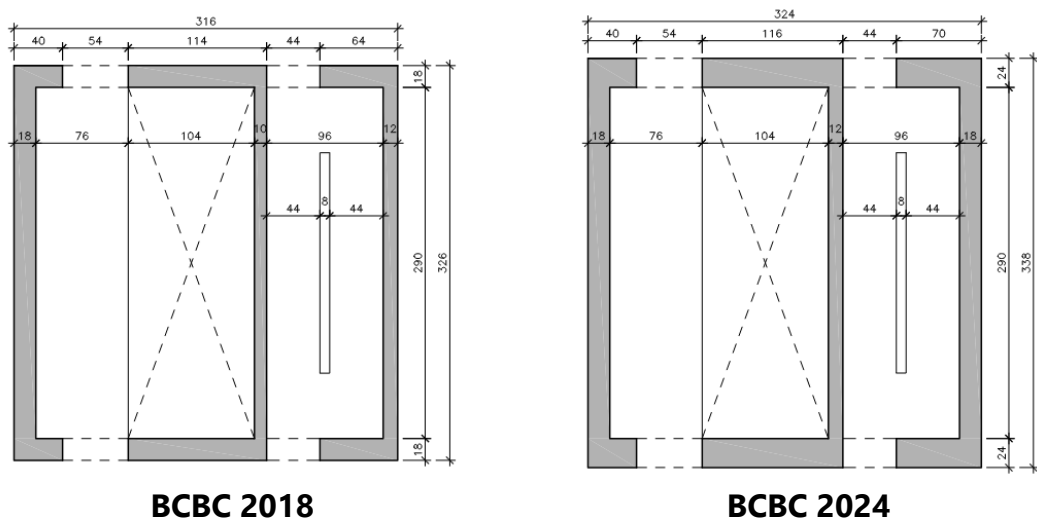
C – Mass Timber Tower Design Group 3 Comparison Plan
